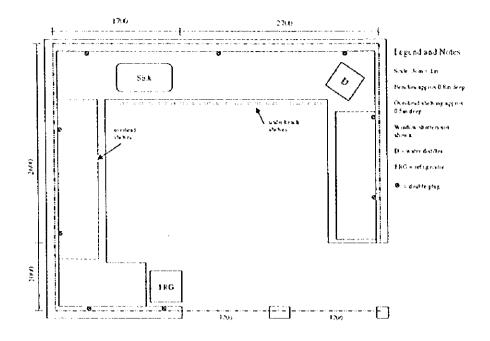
Plan for Field Equipment Room at DOSTE
